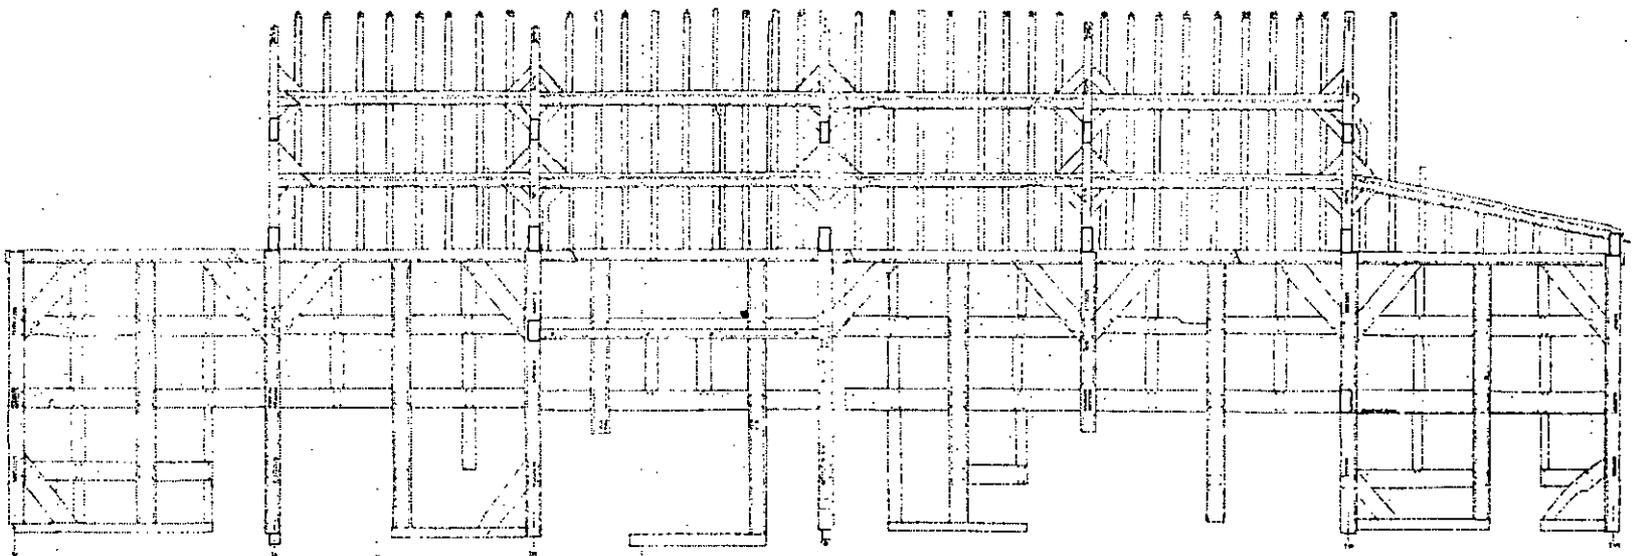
Internal elevation of east wall frame and roof slope, as existing.
